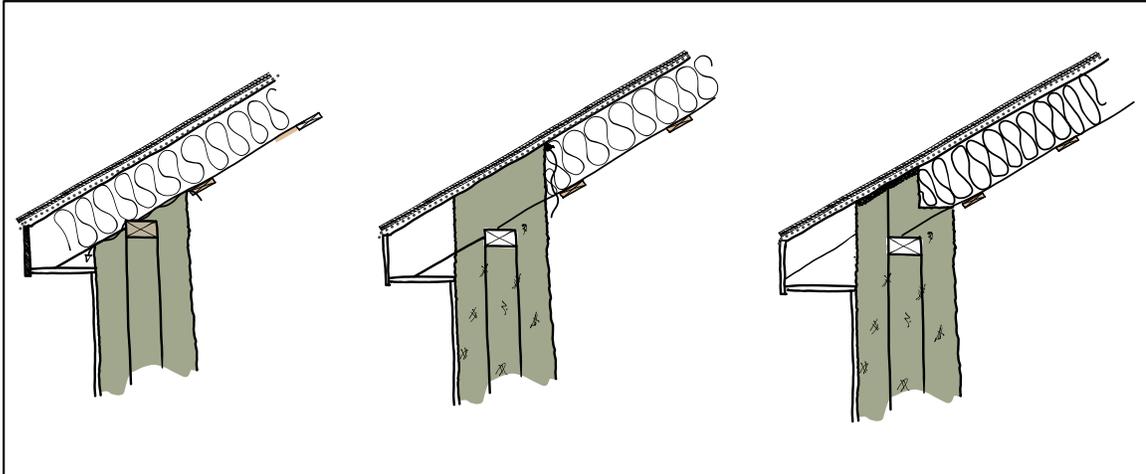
“(A)(B) This wall detail is not a good condition as it allows air leakage between the hempcrete and hemp-quilt insulation.(C) This detail provided adequate sealing between the hempcrete and roof sheathing by sandwiching hemp quilt before installing the sheathing board.” (Stanwix and Sparrow 2014)
